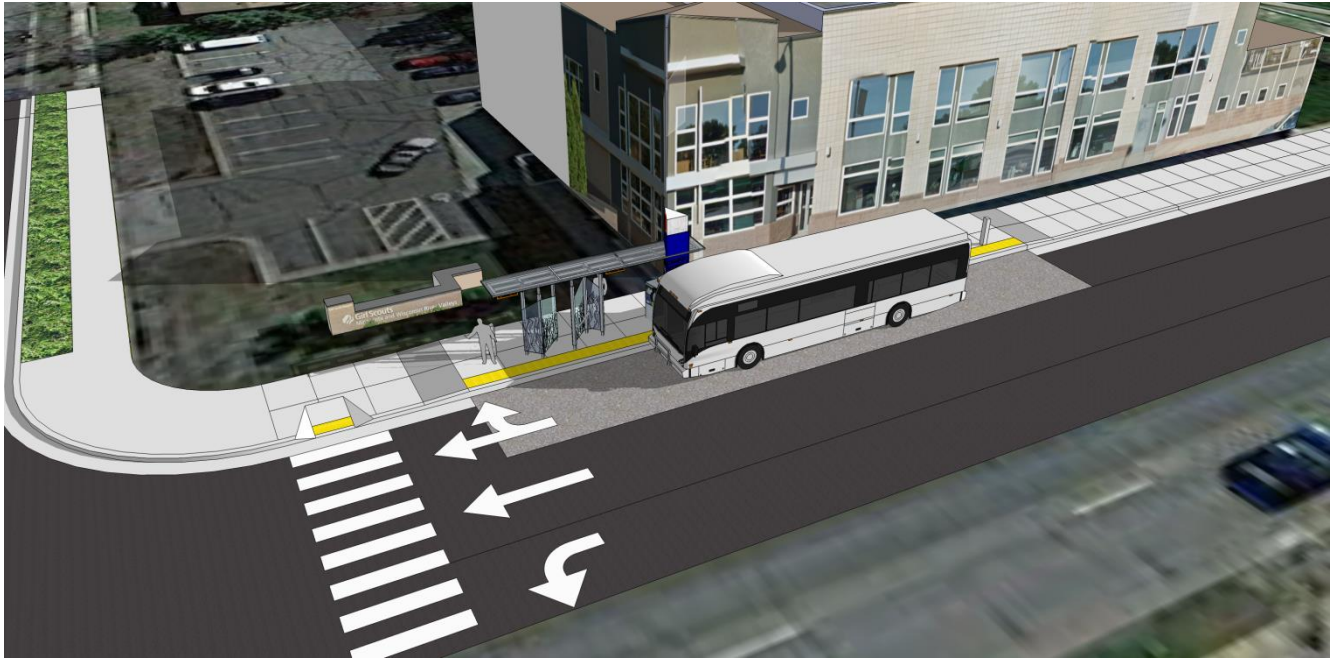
Robert Street Arterial BRT Conceptual Station Design
